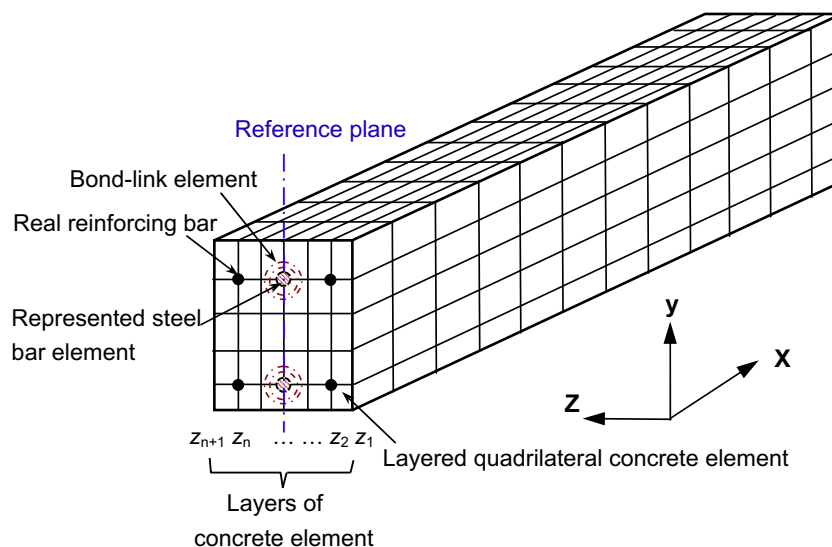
Nonlinear layered finite element procedure for modelling a reinforced concrete beam.
